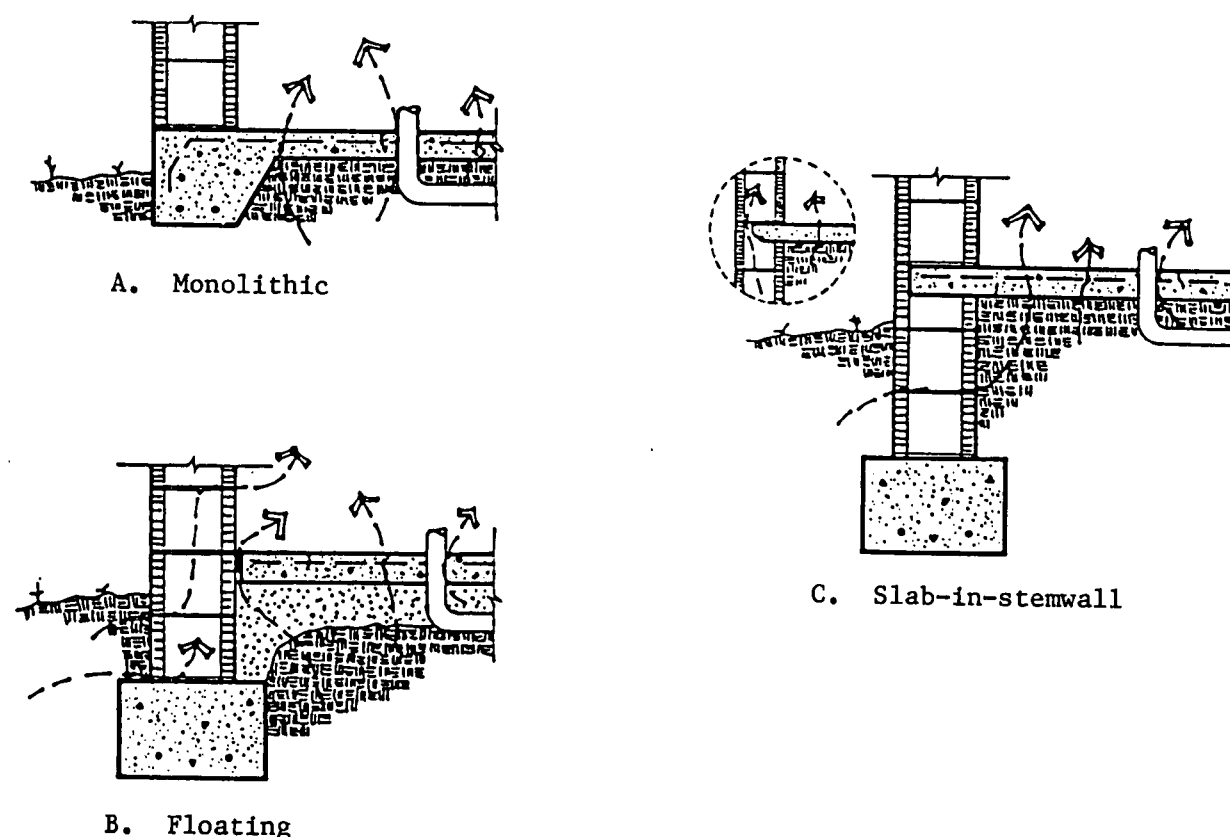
Typical Florida slab construction techniques and soil gas entry routes.
